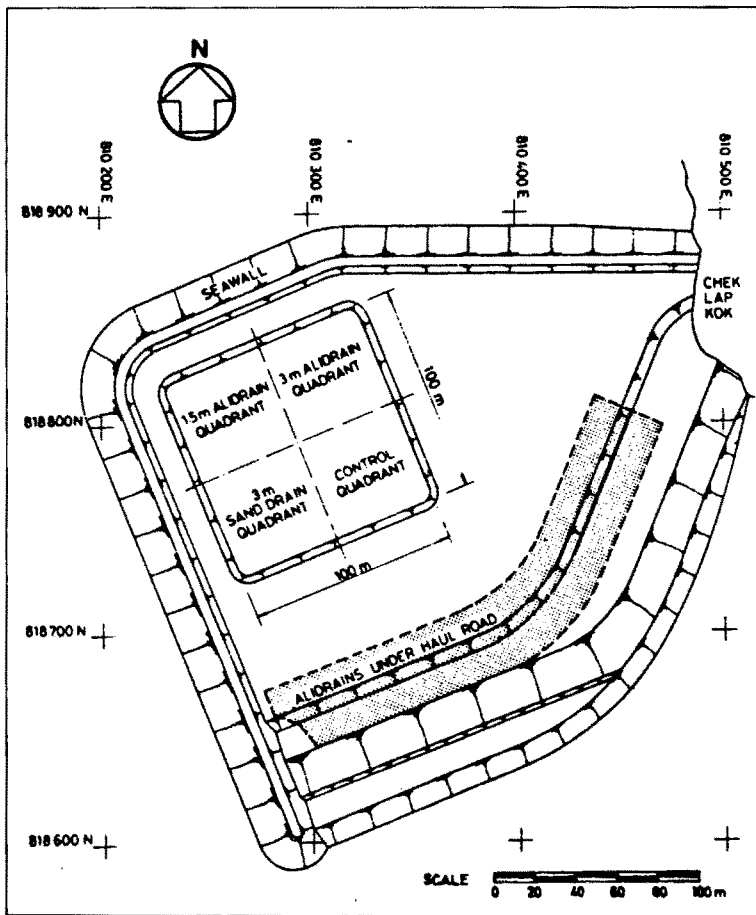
Plan of Test Embankment at Proposed Chek Lap Kok Replacement Airport Site, Hong Kong (after FOOTE, 1982).
